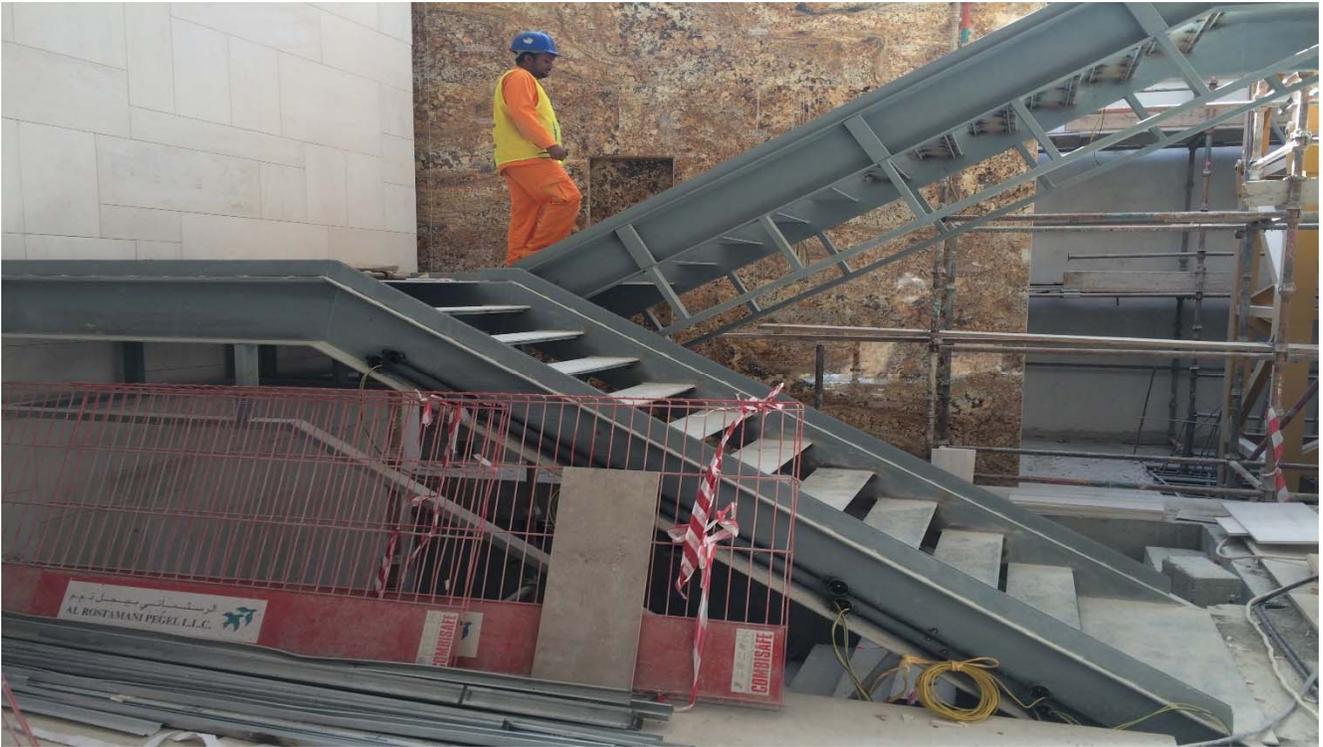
Structural Steel Staircase, Al Wasl - Dubai
